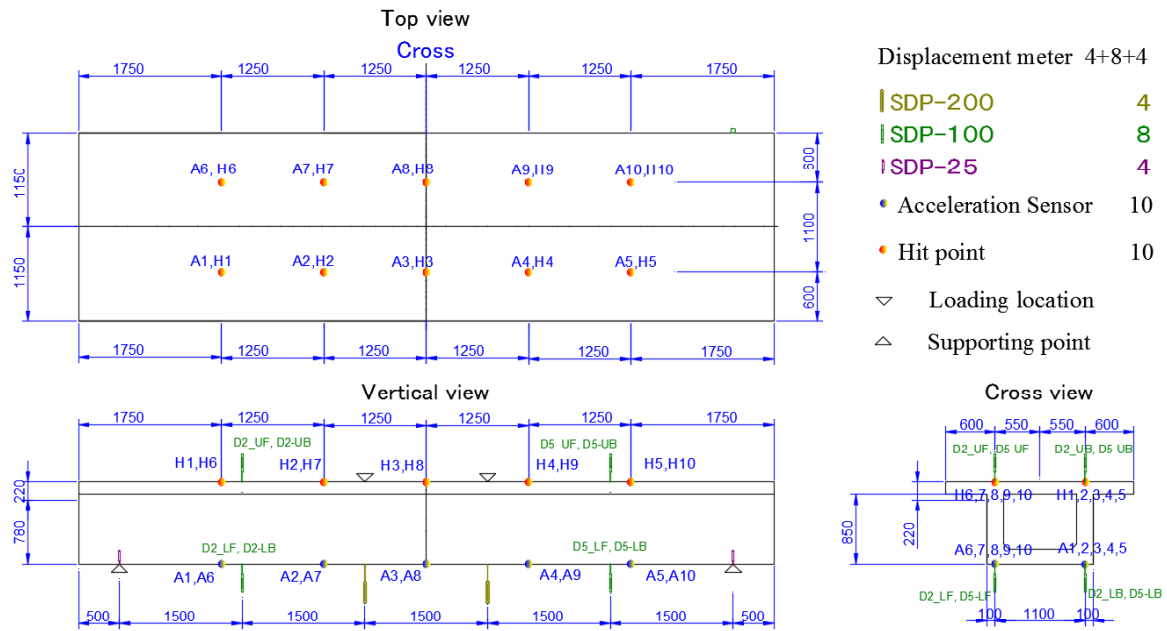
The experiment object, a prestressed box girder. The three-view drawing of the structure, and loading positions, supporting positions for the static-loading experiment, sensor locations and hit points arrangement and damage outside & inside.
